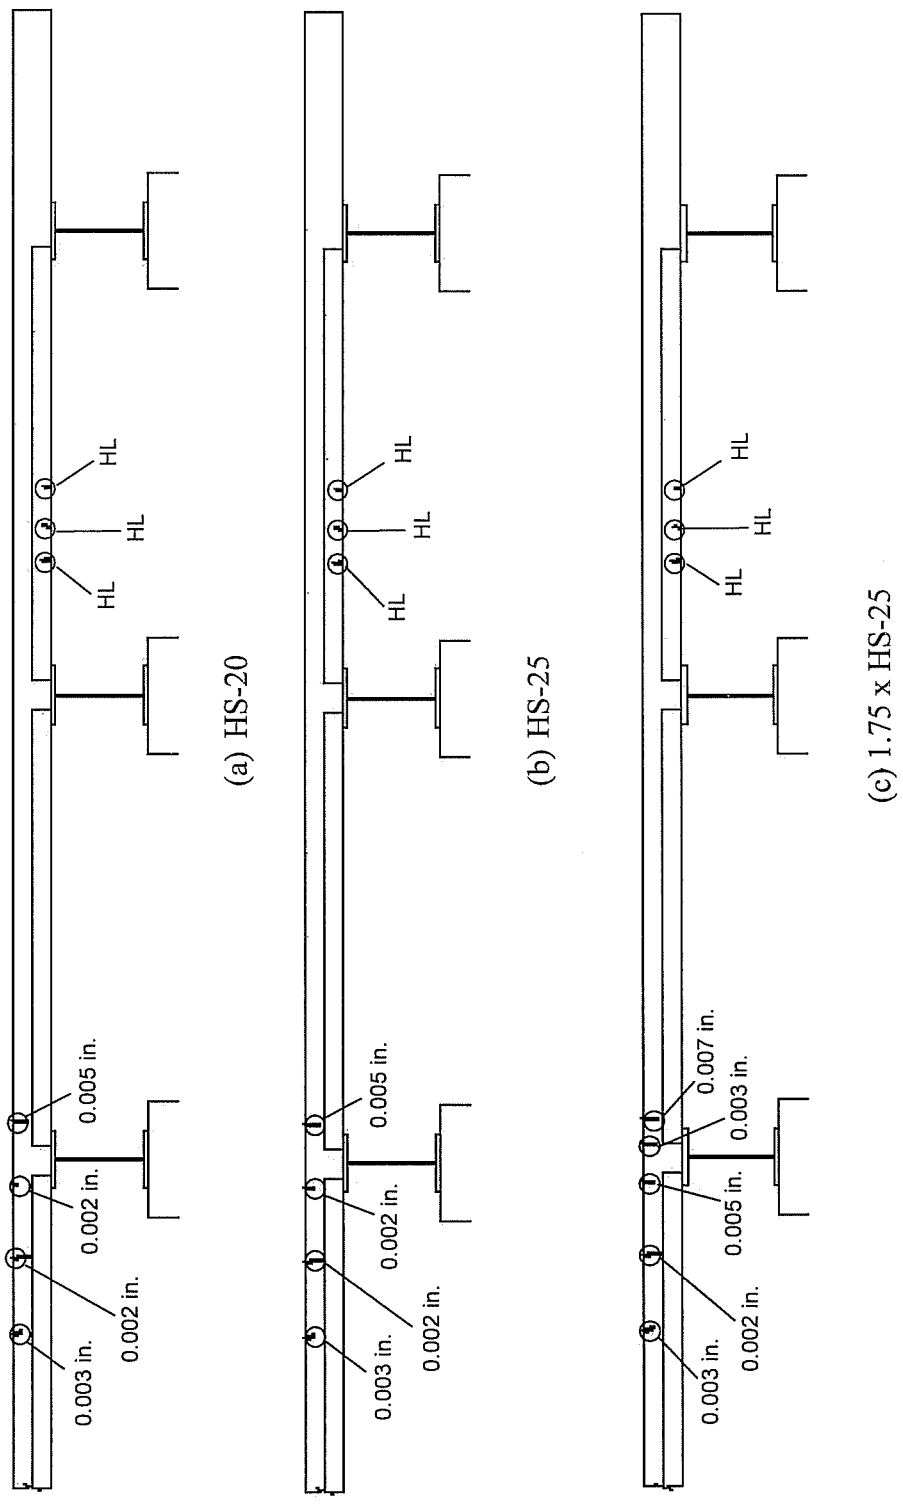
Crack map, 6 in. top reinforcement spacing, negative-moment region, side view of slab
